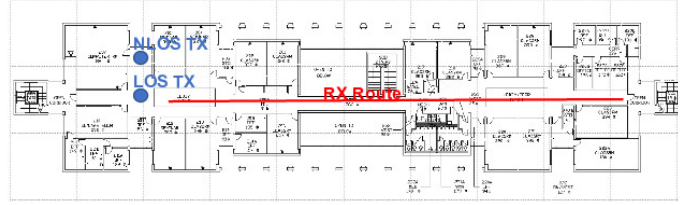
Floor plan for 2nd floor (each grid corresponds to 10m)
